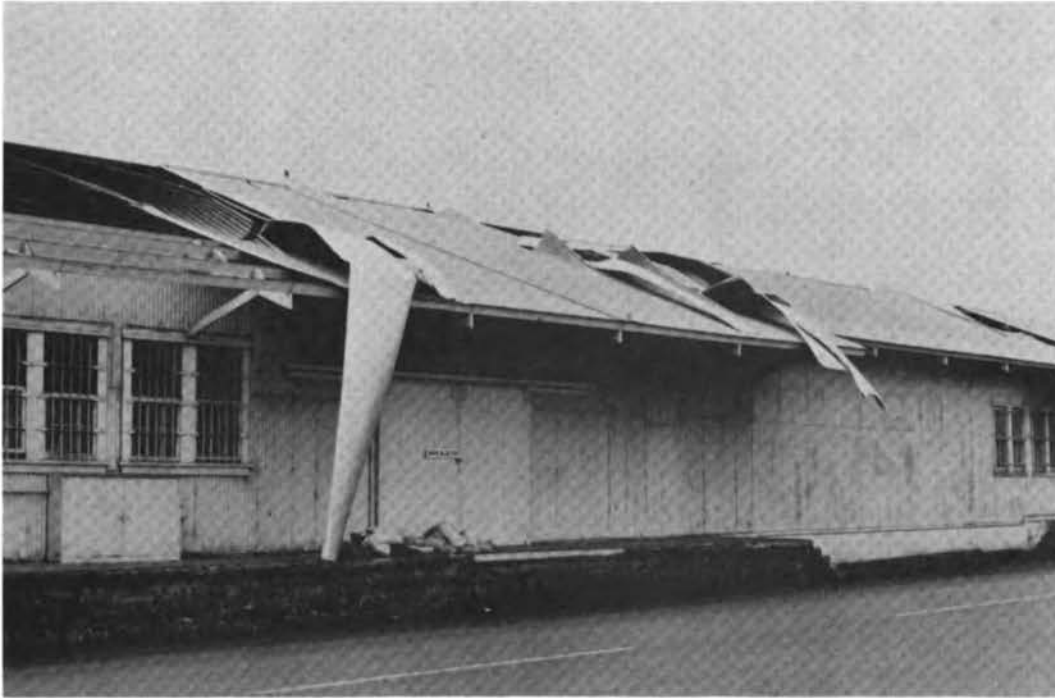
Cladding damage to warehouse buildings at Schofield Barracks, Oahu.
